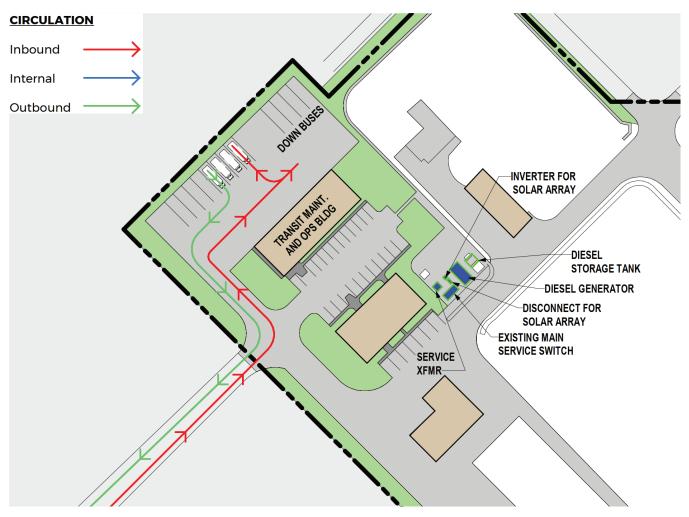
Rio Vista Delta Breeze Existing Facility and Site Circulation
